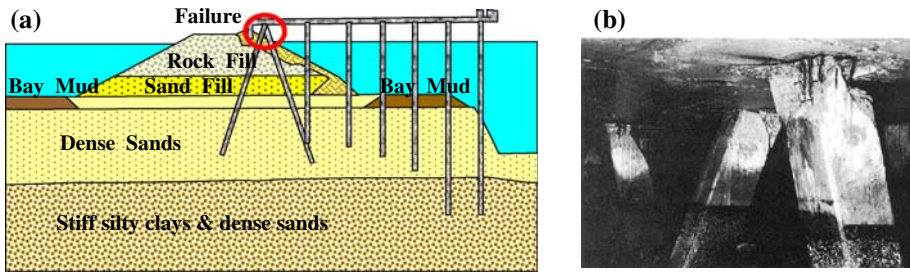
7th Street terminal, Oakland, after the Loma Prieta earthquake: (a) cross section, (b) damage to batter piles (photo after [SEAOC 1991](#))
